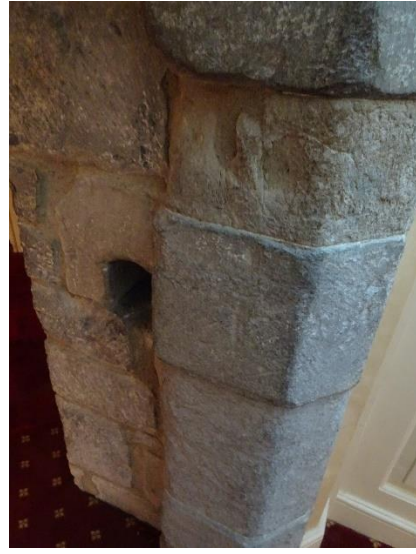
Medieval doorway S23-4, between chapel S23 and Northeast Tower, looking southwest
